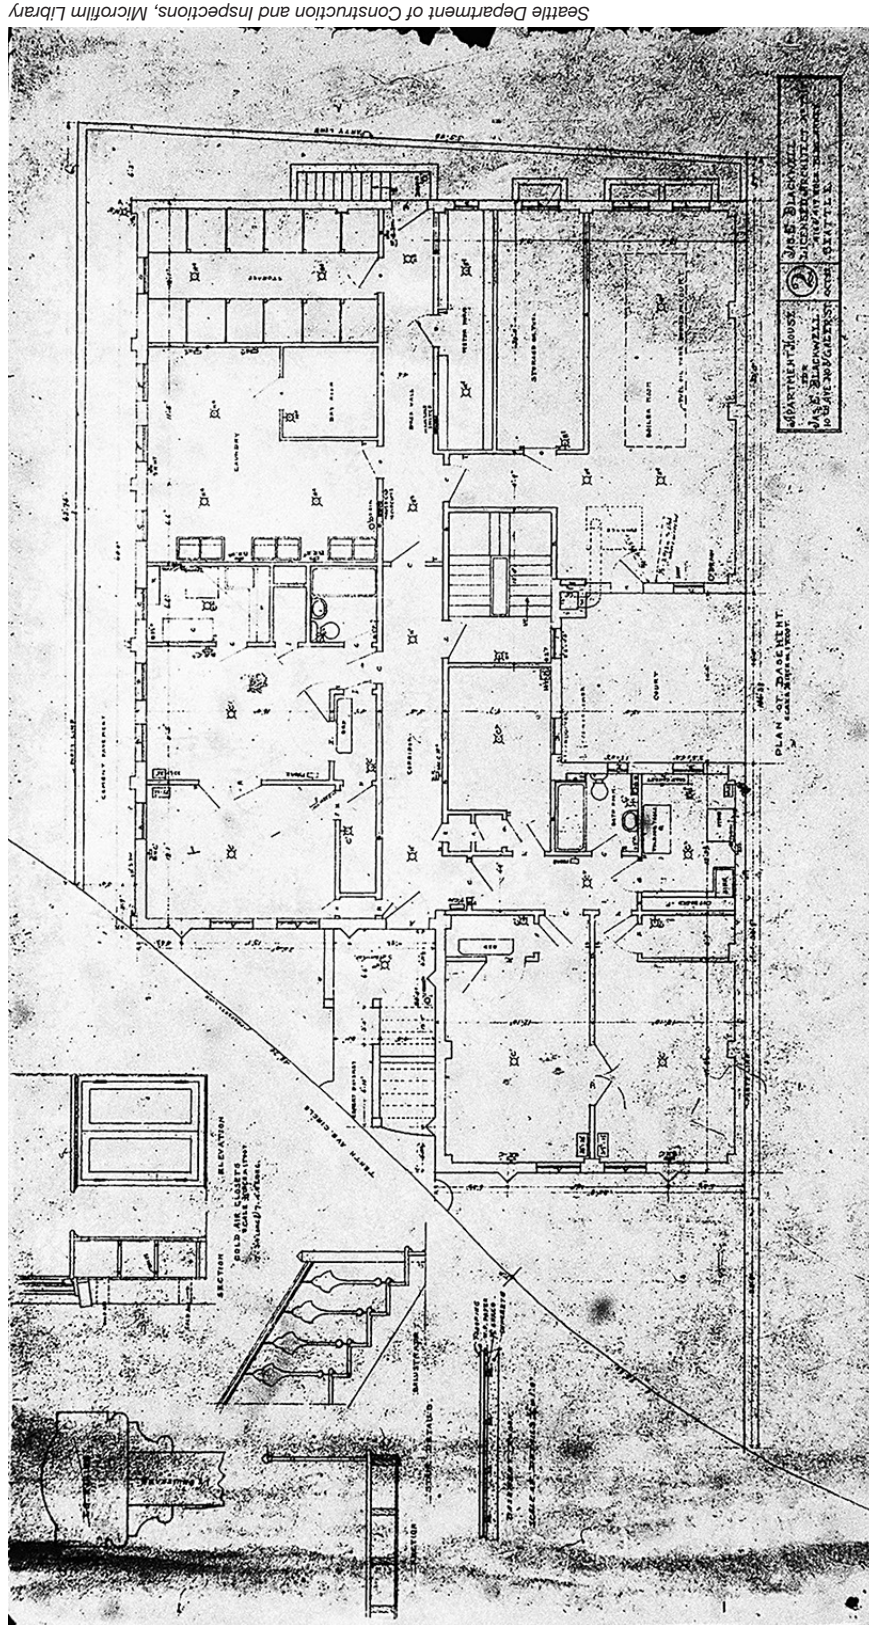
Original 1922 Blackwell blueprint showing basement floor plan and detail features.
